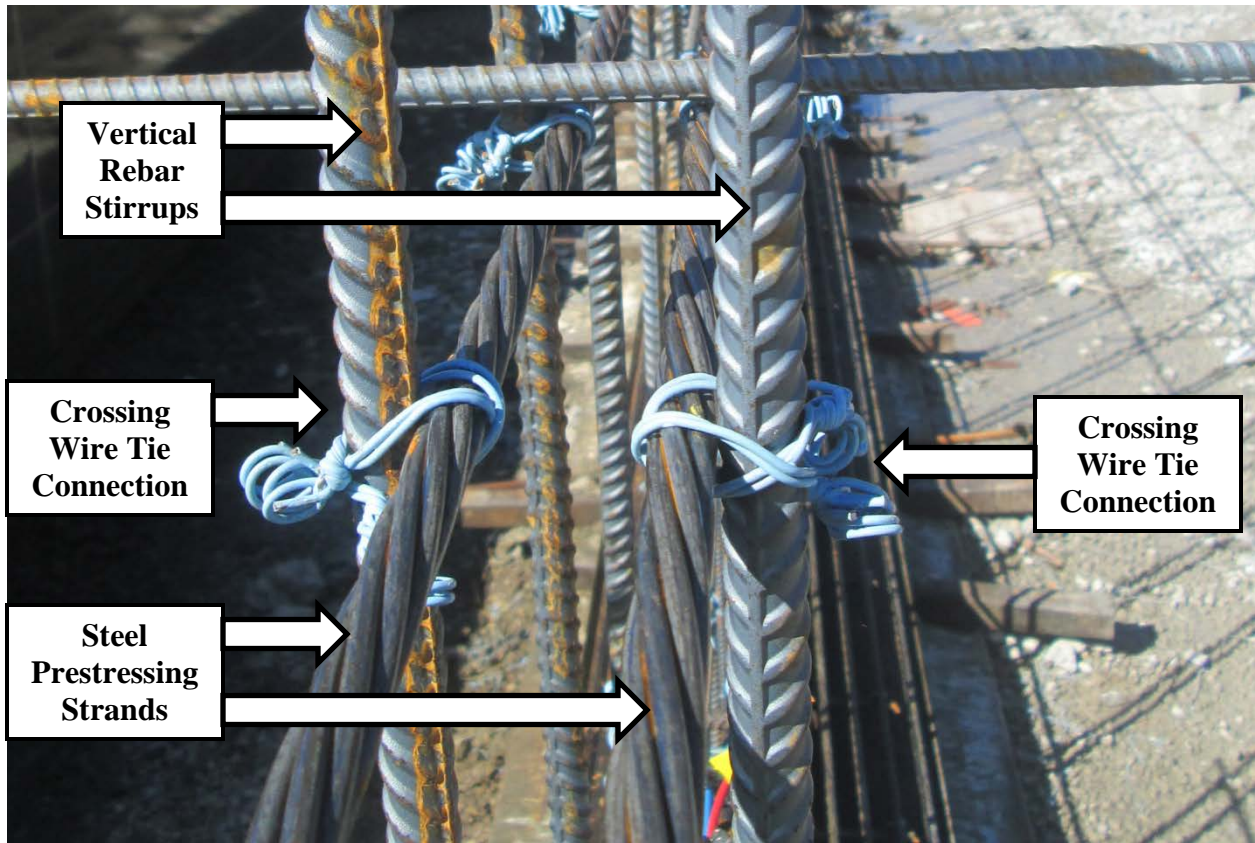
Double-tied Stirrup-to-Tendon Connections
